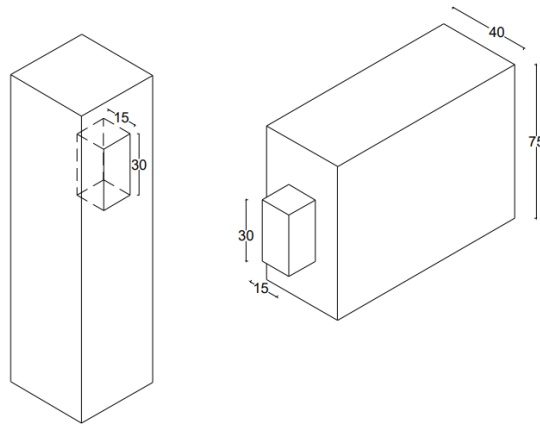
5: Mortise and tenon joint between column and beam at third floor.
